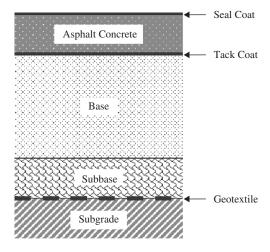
Typical Section of an Asphalt Concrete Pavement
